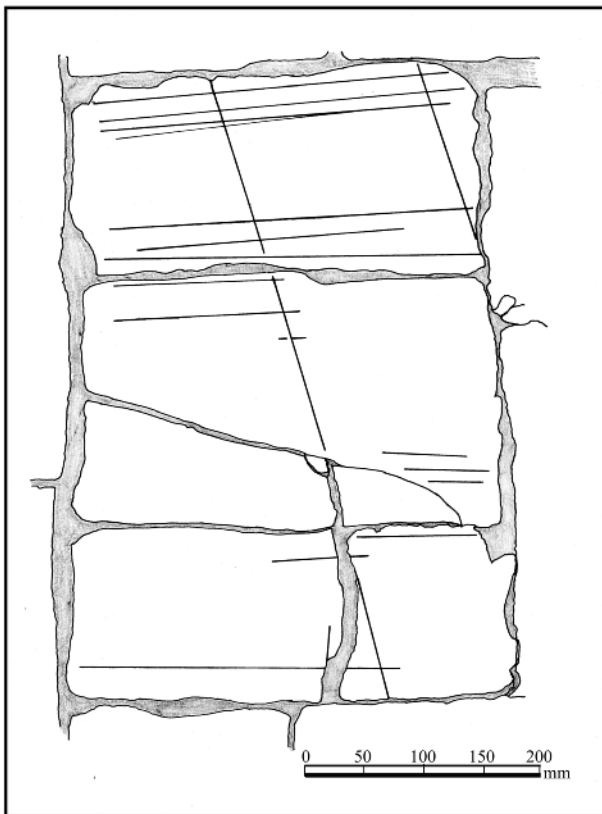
Kenilworth Abbey: the Barn, ground floor: a grid incised on the floor slabs, detail
